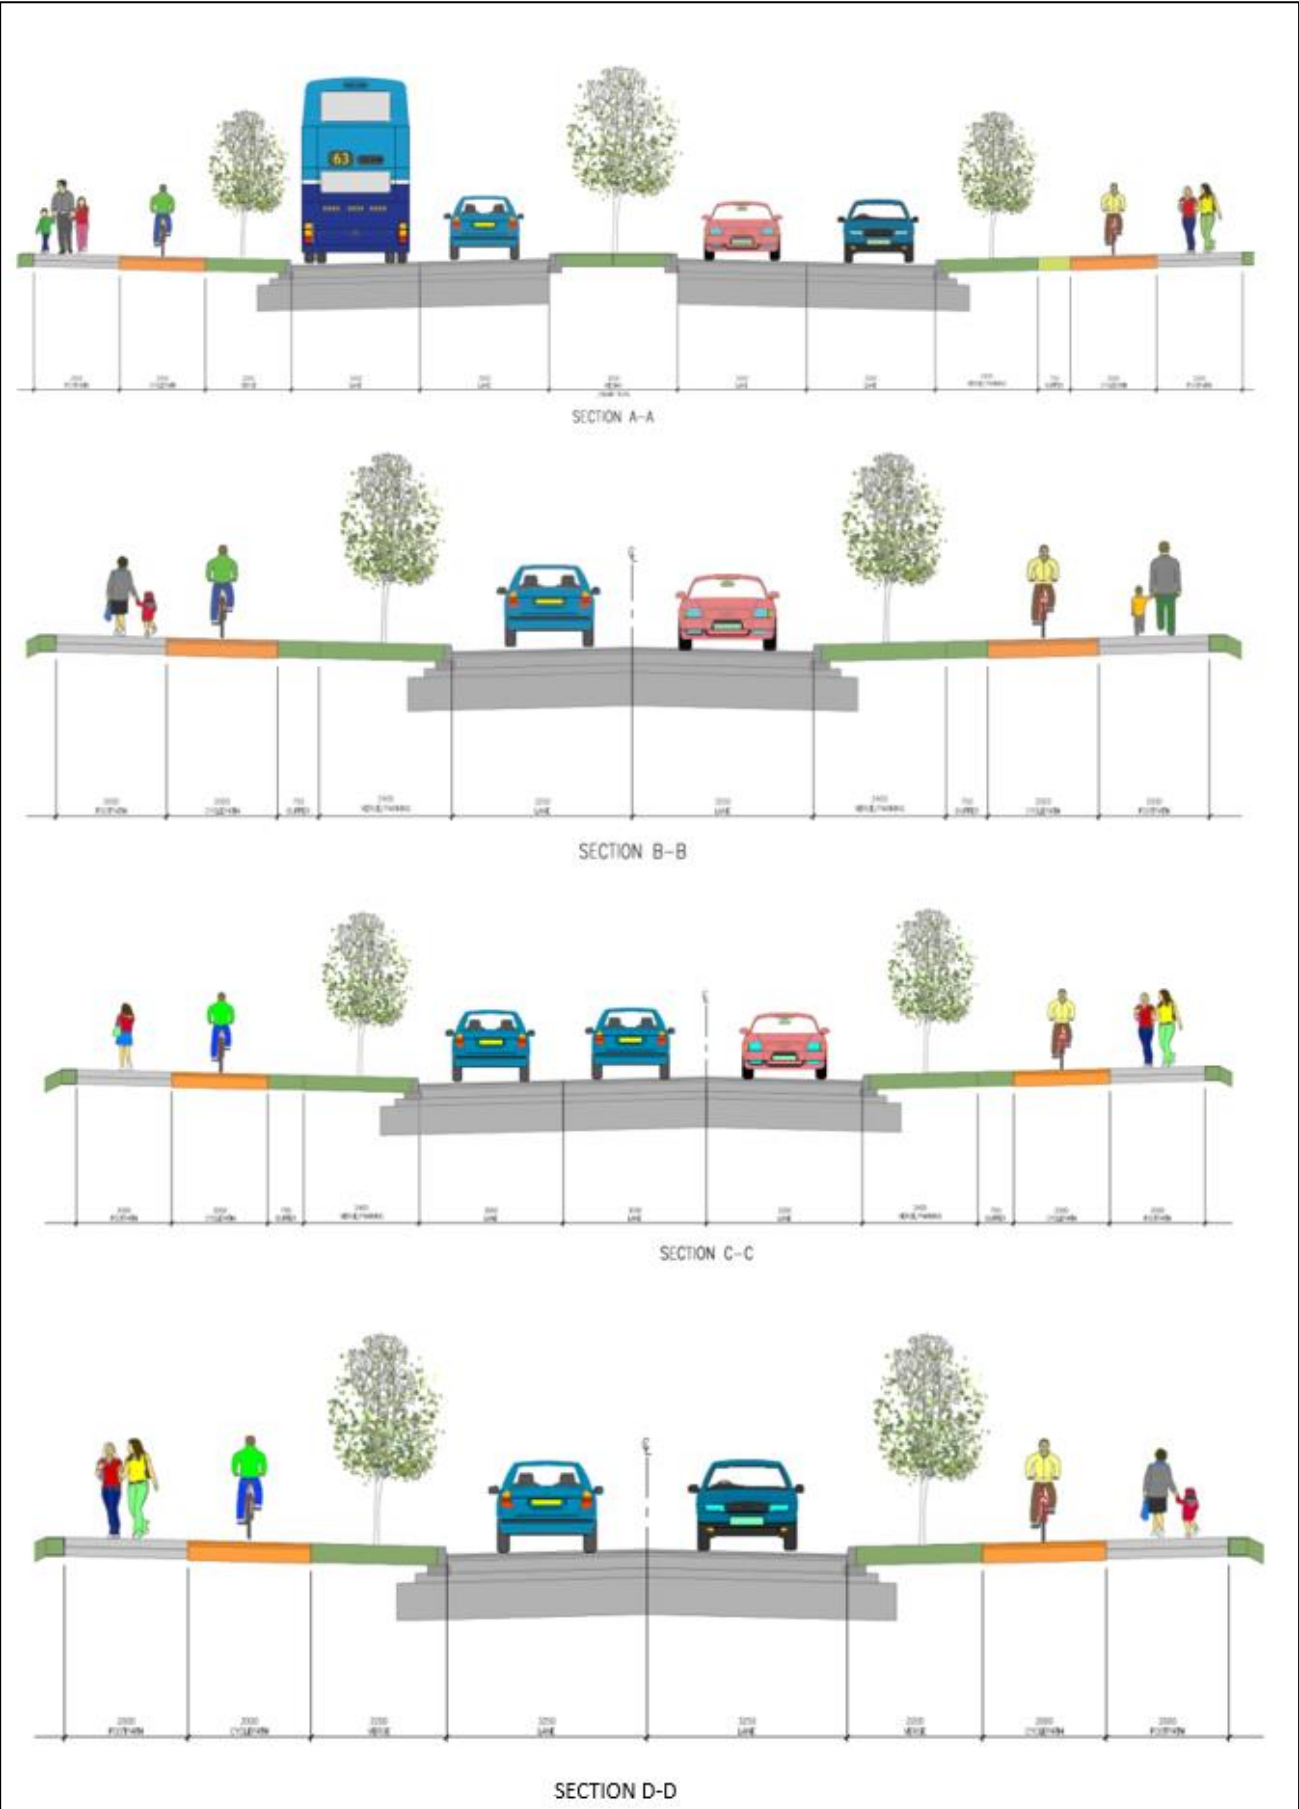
GDRS Typical Sections Layouts (source: GDRS EIAR)
